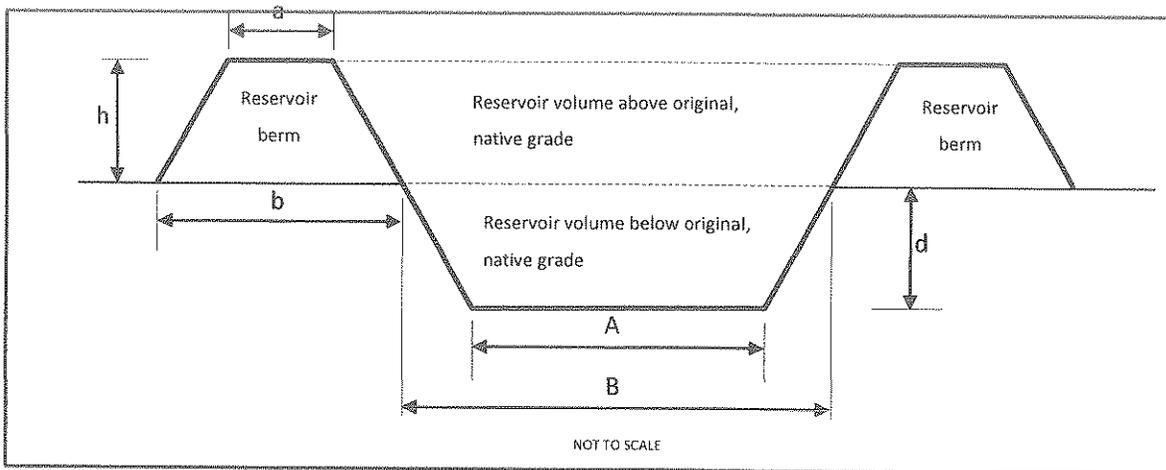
Cross Section of Typical Reservoir and Surrounding Berm.
